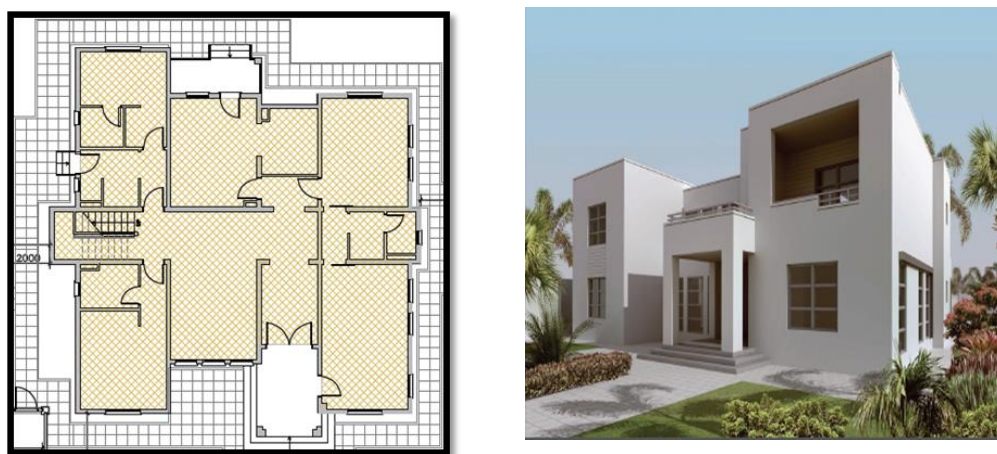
The dominant house type in Al Falah community; the five bedroom modern style house ground floor plan and main façade perspective
